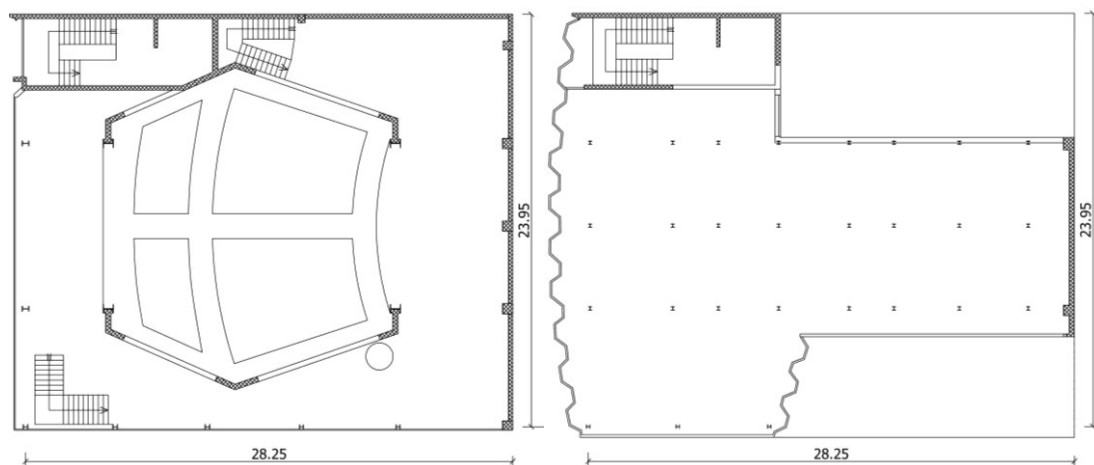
Plants of floors 0 to 2 (left) and of floors 3 to 6 (right).
